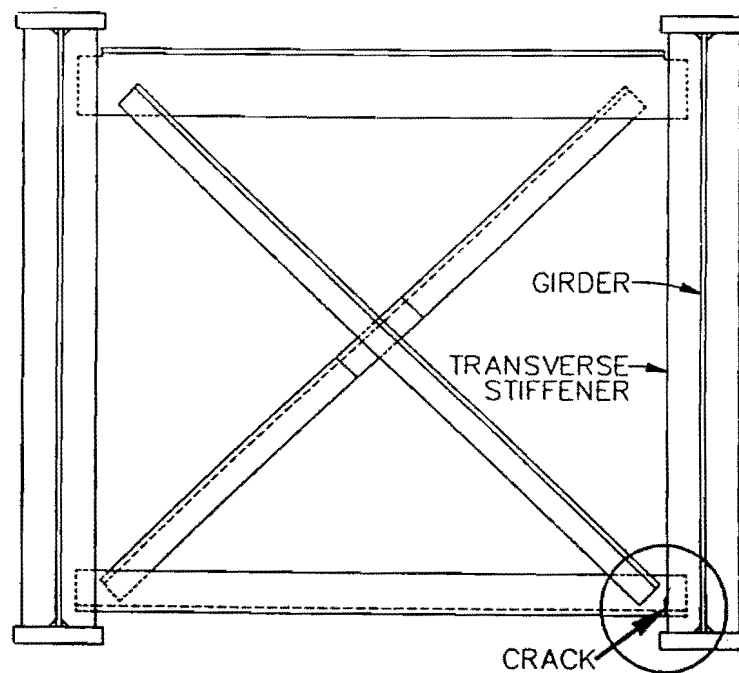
Typical location of Type B1 fatigue cracking.
